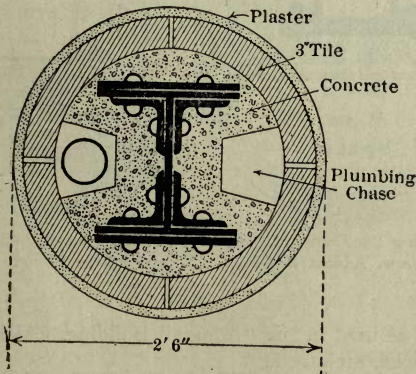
Concrete and Tile Casing and Pipe Chase, Filene Store Building, Boston. — D. H. Burnham & Company, Architects.
